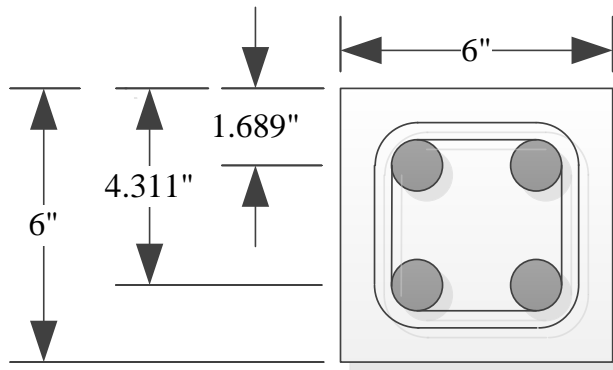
1 Cross section of MMFX Beam (UHP-FRC #1)
